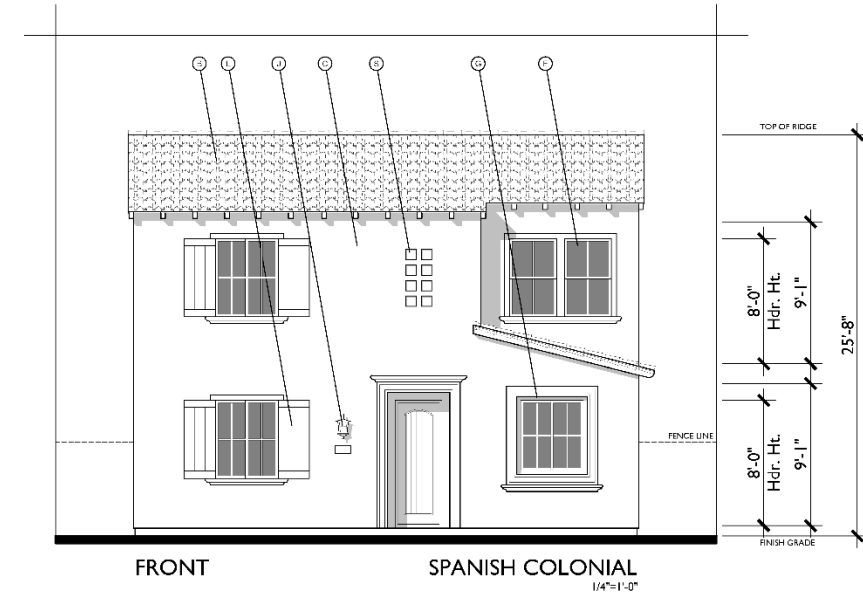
Spanish Colonial Elevation - Cluster Plan 1
